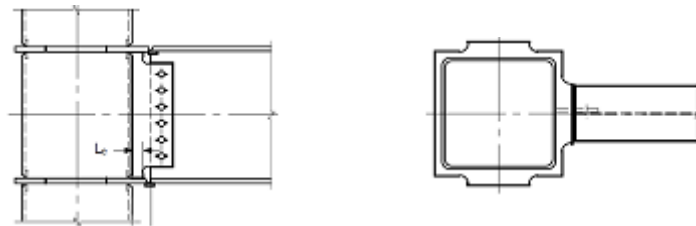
Beam-to-column connection with through diaphragm for field welding [51]
